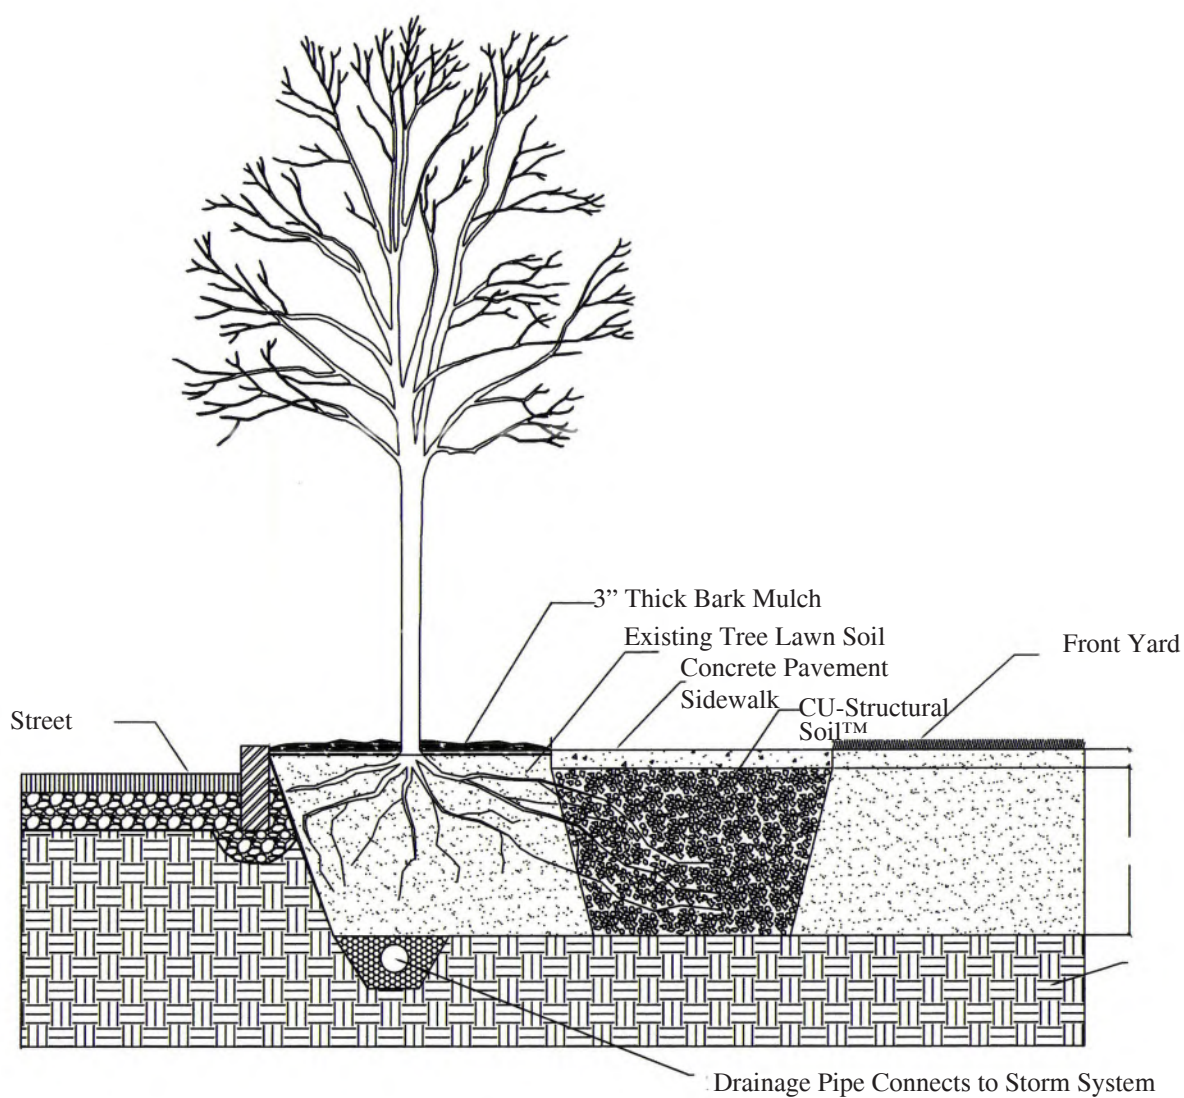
CU-Structural Soil™ break-out zone from narrow tree lawn to adjacent landscape area
